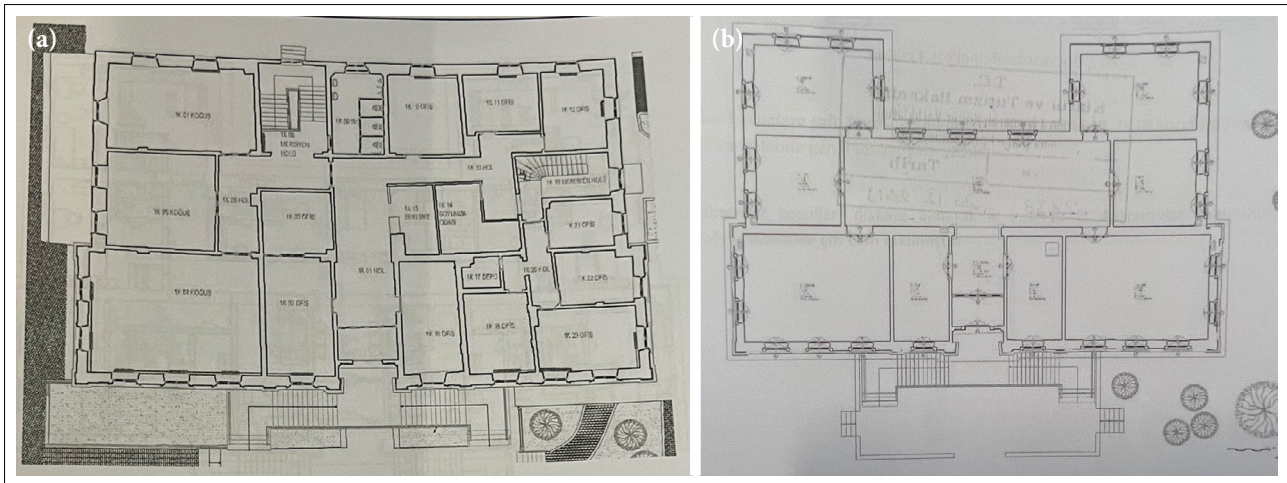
(a) Ground floor plan survey, 1985; Architect: Hamdi Göytan; (b) Ground floor plan restitution drawing, 2013, Detay Architecture (Conservation Council Archive).
